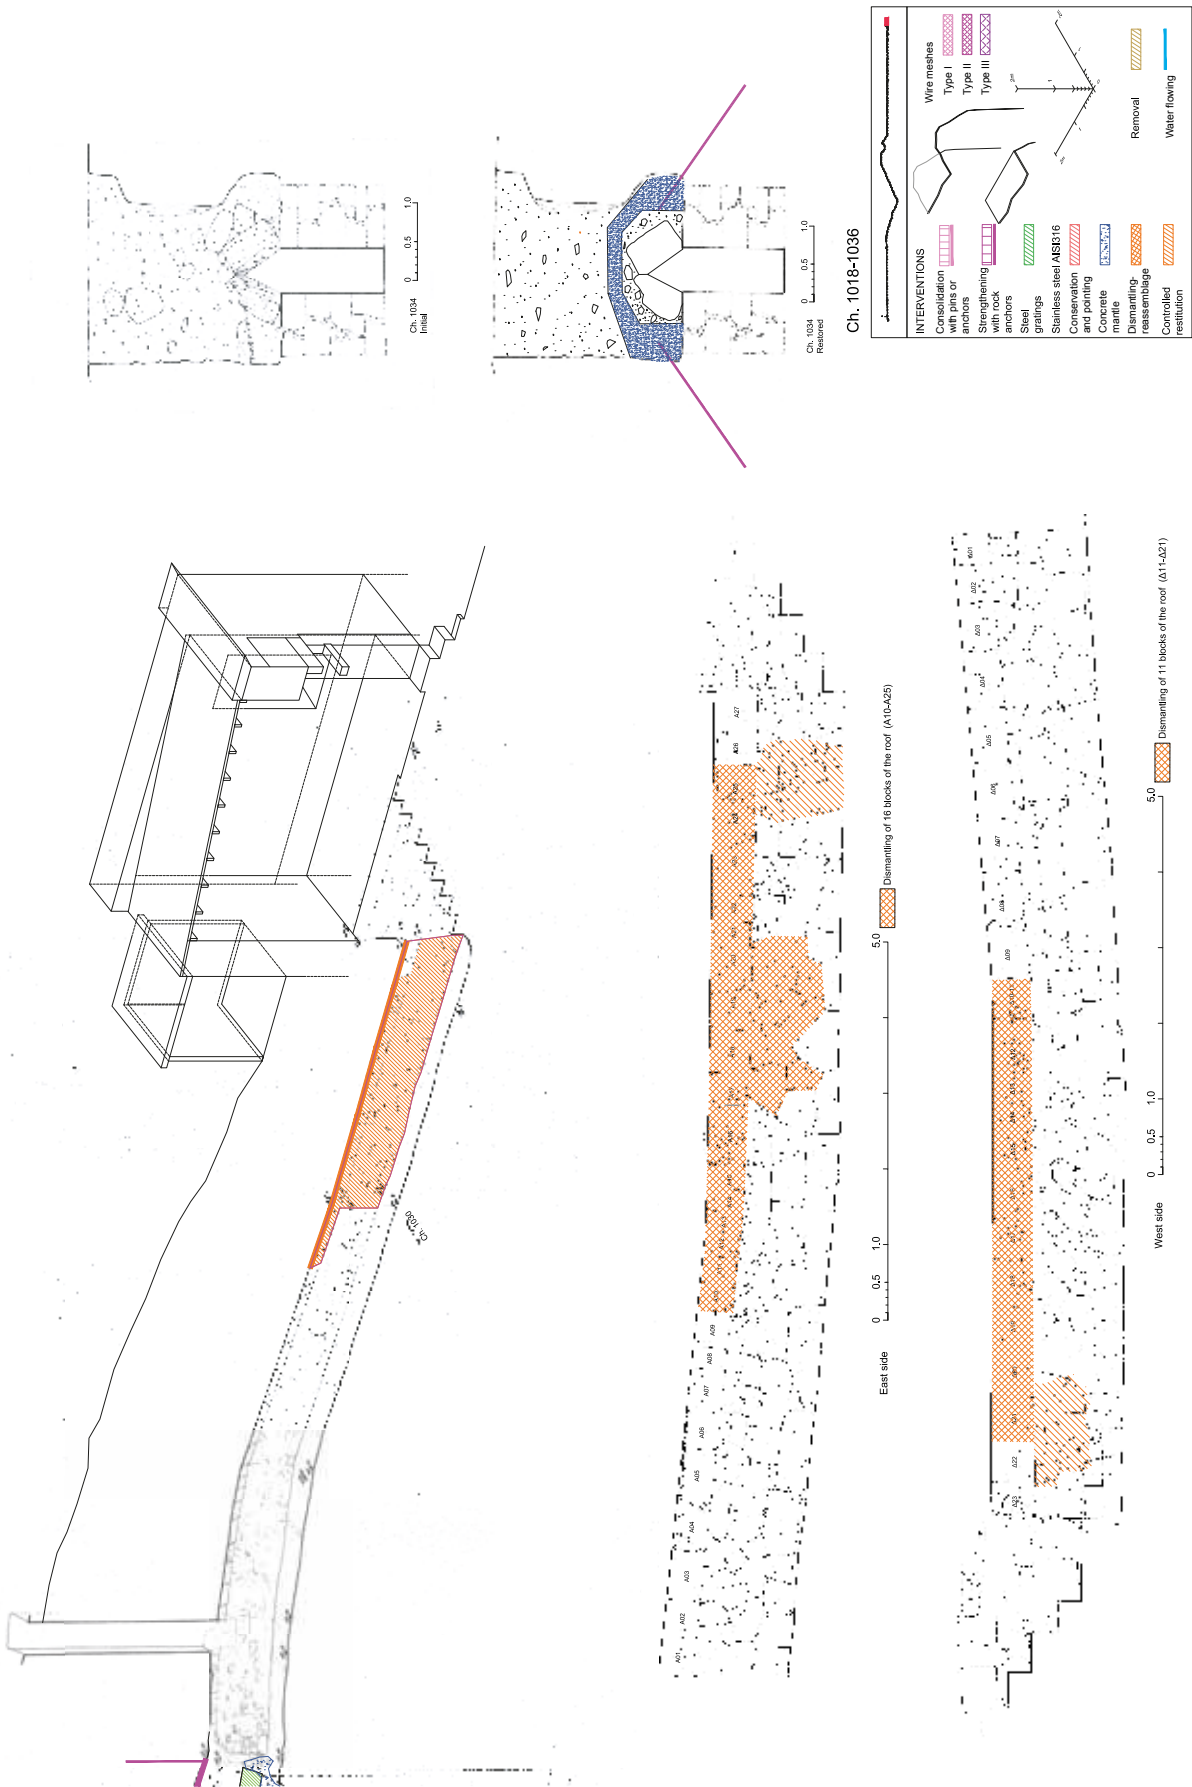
Isometric plan of the tunnel of Eupalinos (scale 1 : 200) with sections (scale 1 : 100), Ch. 1018–1036
